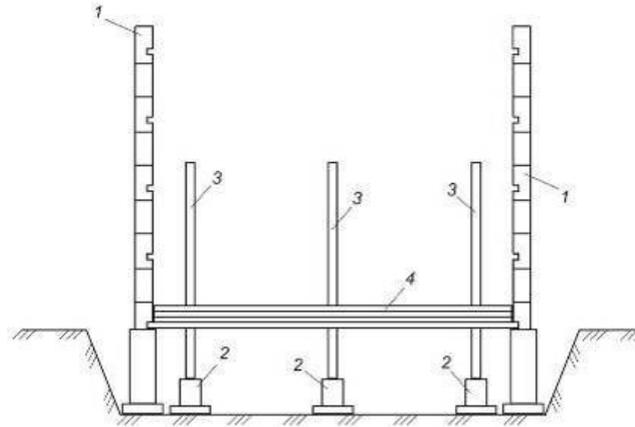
Installation of embedded frame with usage a lifting slab panels method (stage of floor slab panels concreting):
